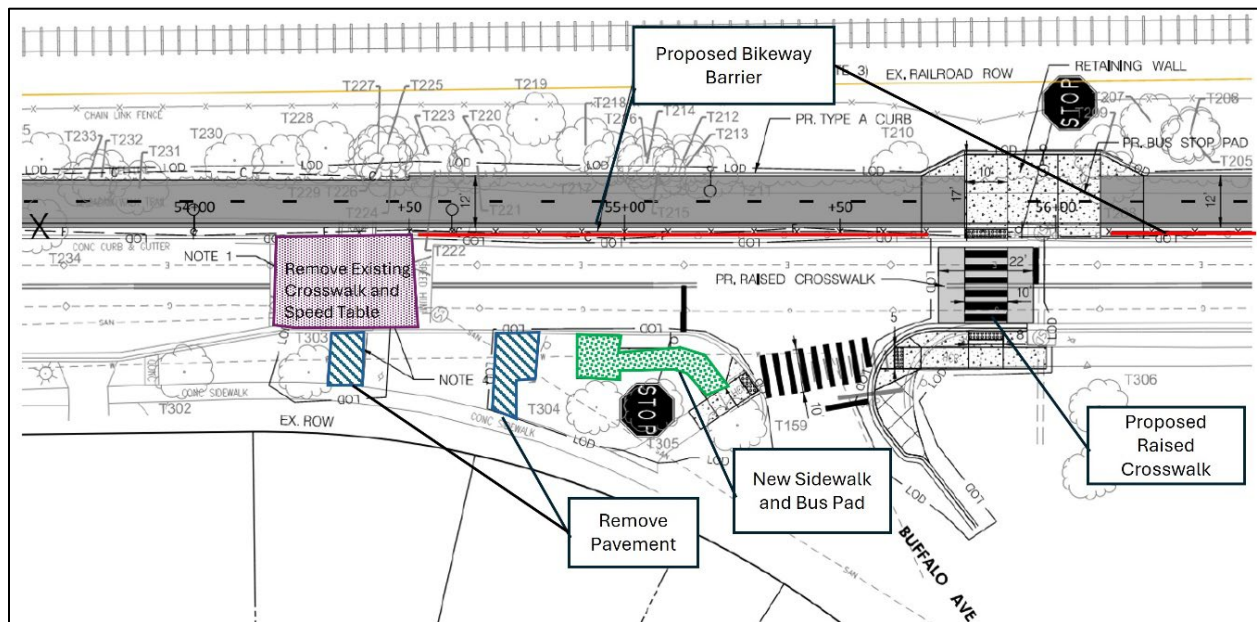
Proposed Plan View - Takoma Avenue/Buffalo Avenue Intersection
